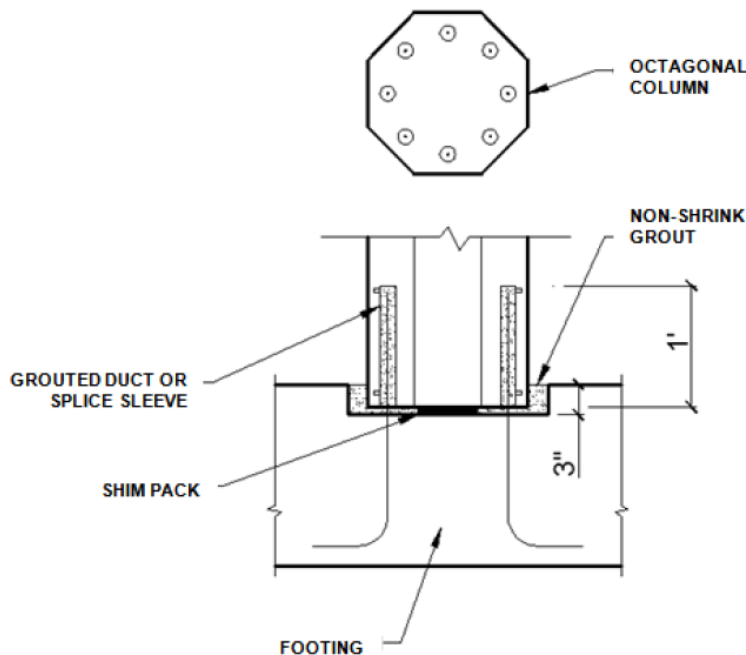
Precast column-footing connection with grouted duct/splice sleeve and socket connection proposed by Aktan and Attanayake (2013)
